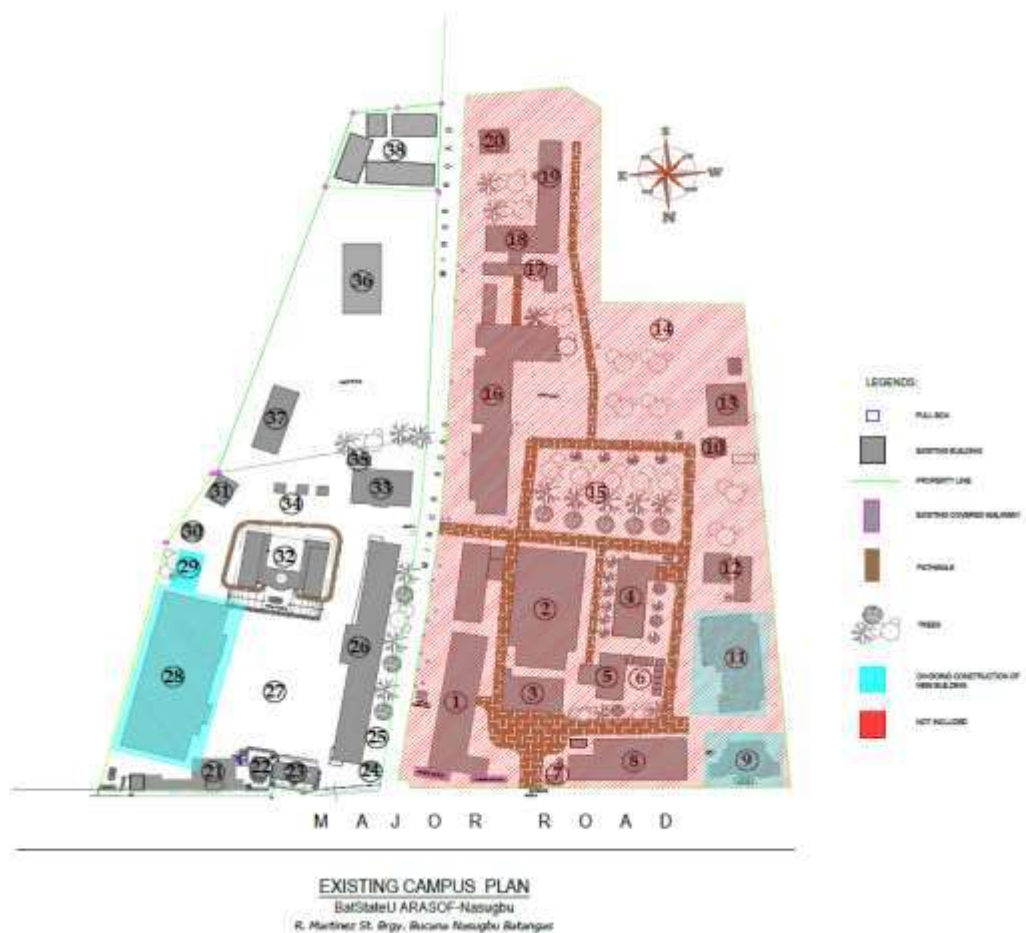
BatStateU ARASOF-Nasugbu Plan Ground 2
